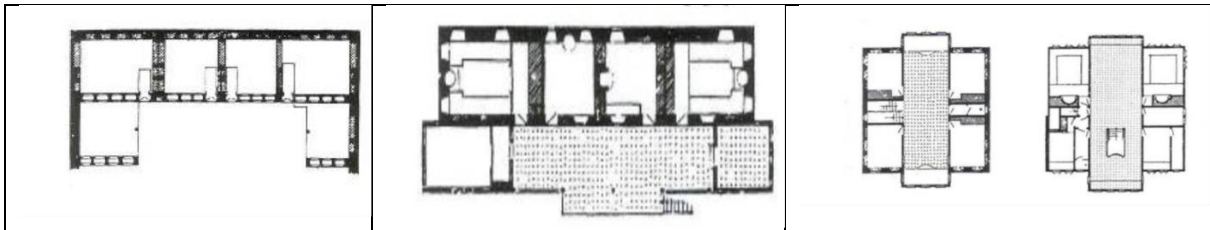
From left to right first plan (a) Hayat (garden)+room(s)+without sofa (hall), (b) second plan Hayat (garden)+room(s)+ with external sofa (hall), third plan (c) inner sofa (Berk, 1951)
